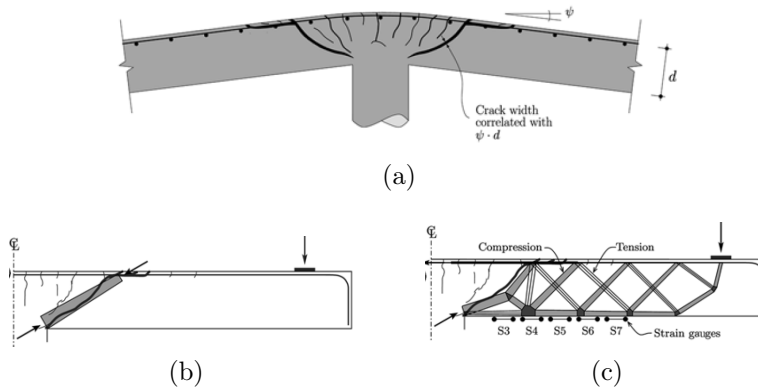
Mechanical model of Muttoni. (a) Cracking pattern of slab after failure;(b) theoretical strut developing across the critical shear crack; and (c) elbow-shaped strut. [26]
